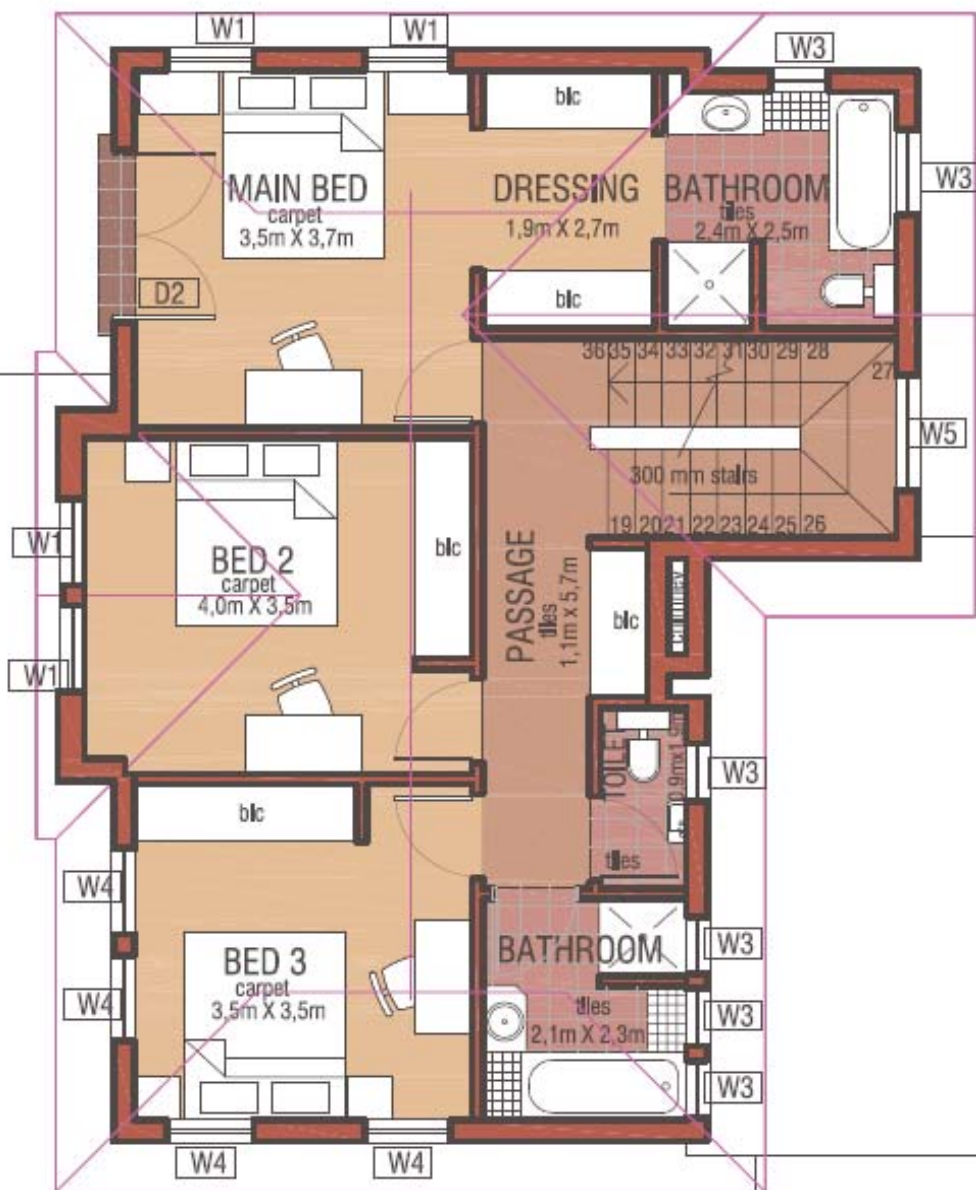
Layout of type-D first floor (Arlington representation, 2008)
